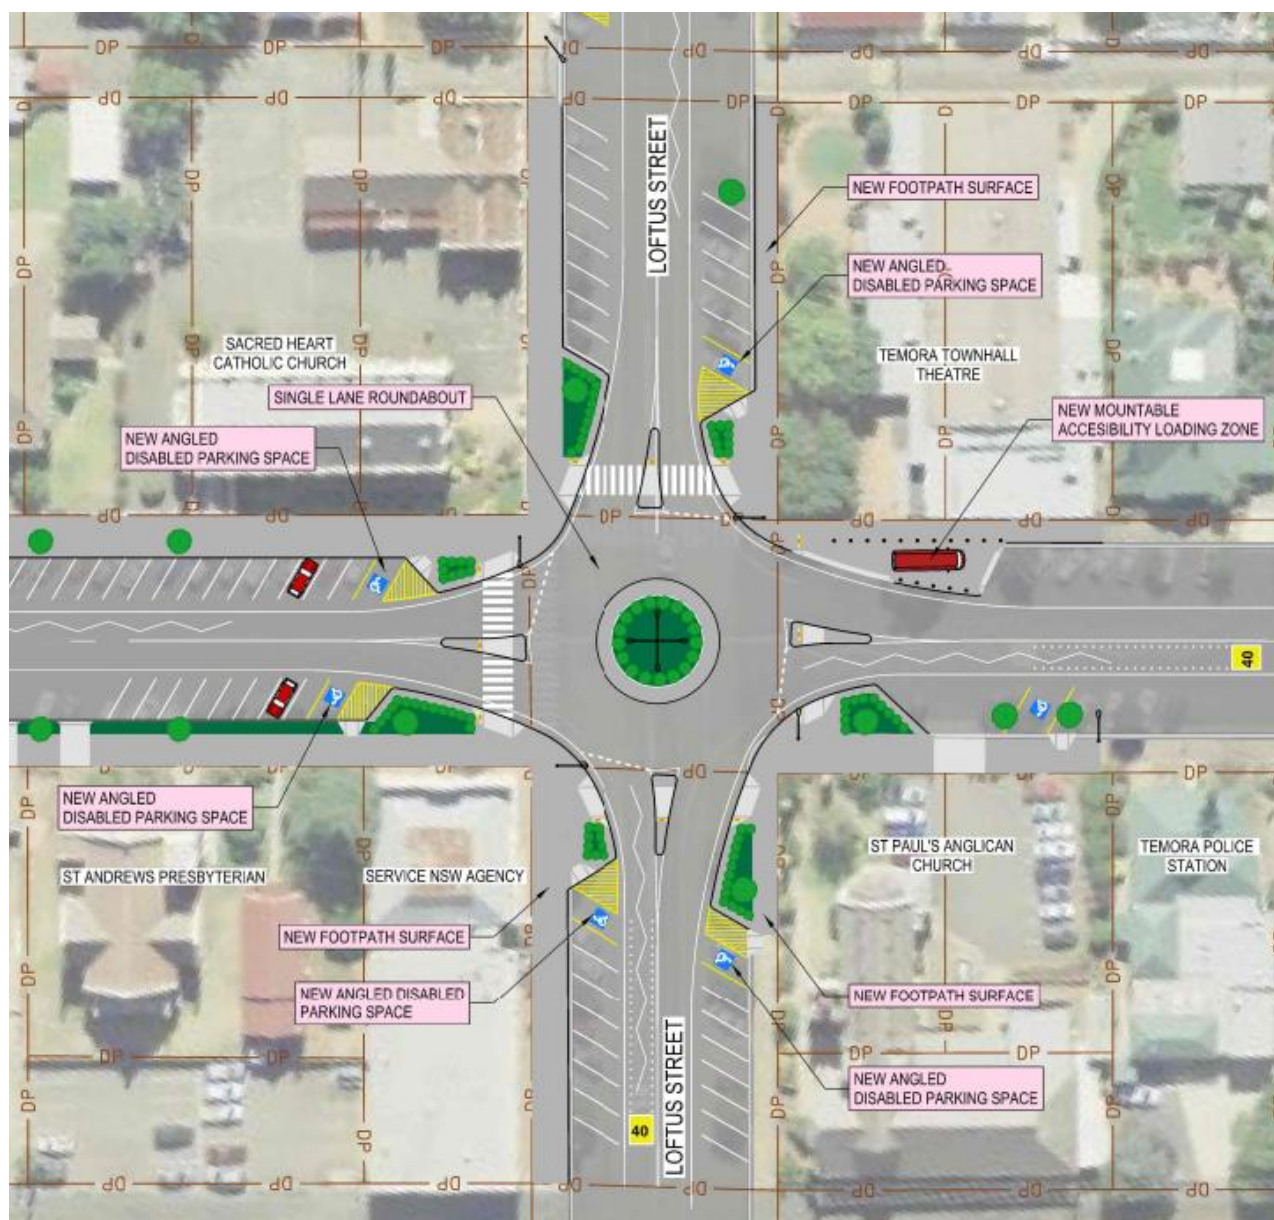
Updated version of plan, showing retained angle parking, with blister to support new proposed roundabout, and hearse loading bay deleted
